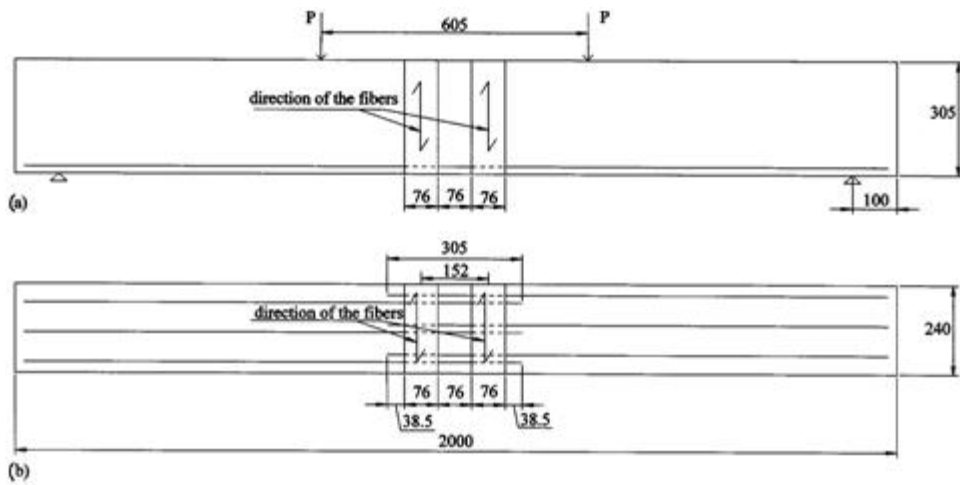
Longitudinal and cross-sectional details for beam specimens (a) side view; (b) bottom view (Hammad et al, 2004).
